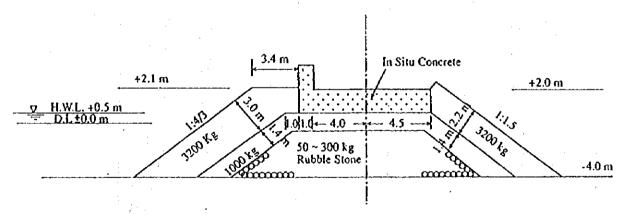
Standard Cross Section of Breakwater (-4.0m)
